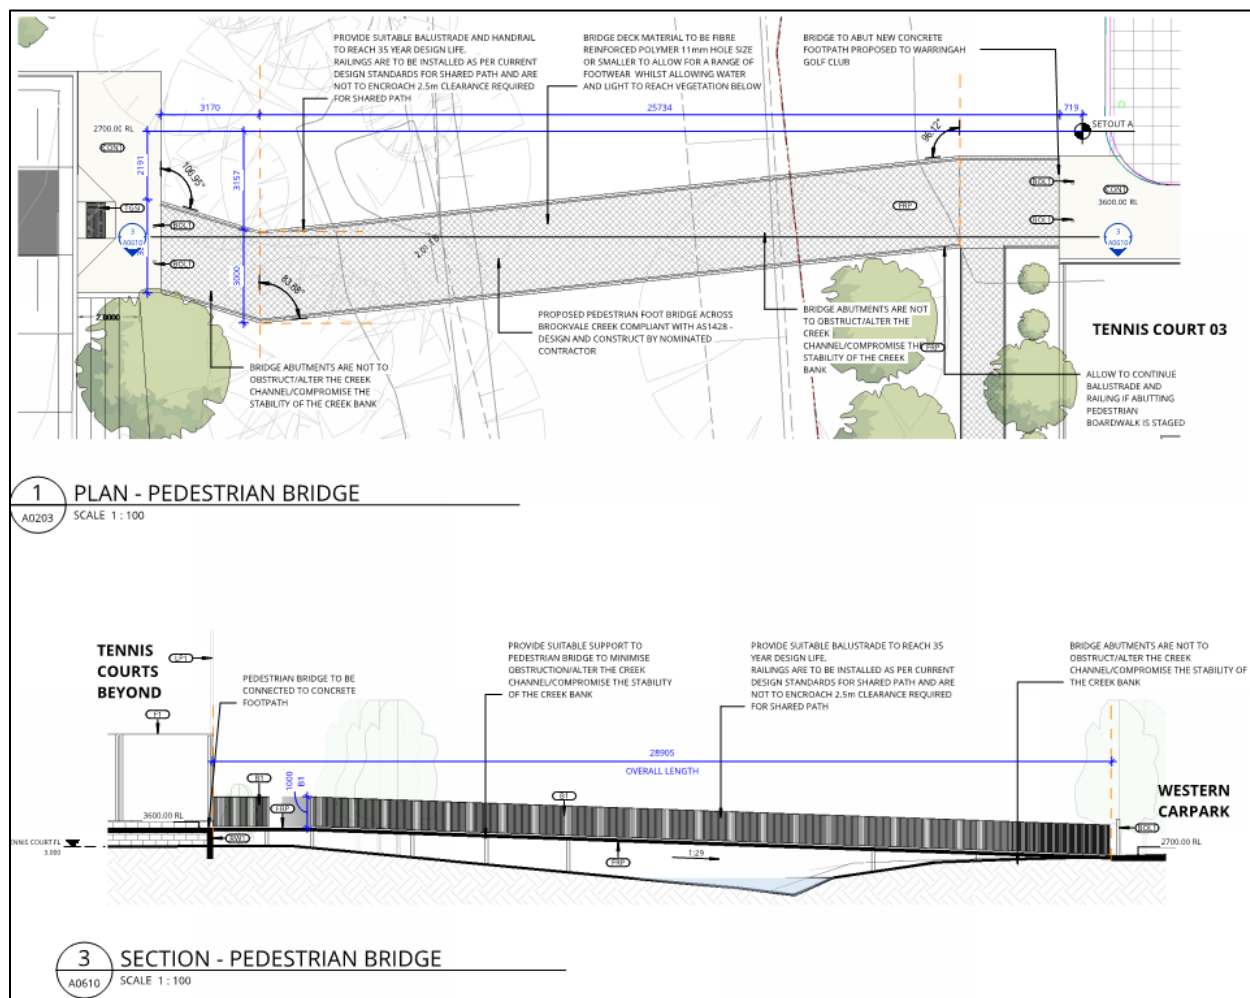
Pedestrian Bridge Drawings (Source: Webber Architects, 2024)
